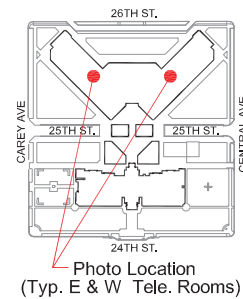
In-Floor System at Typ. Telecom Rm, East & West, Floors 1-4
